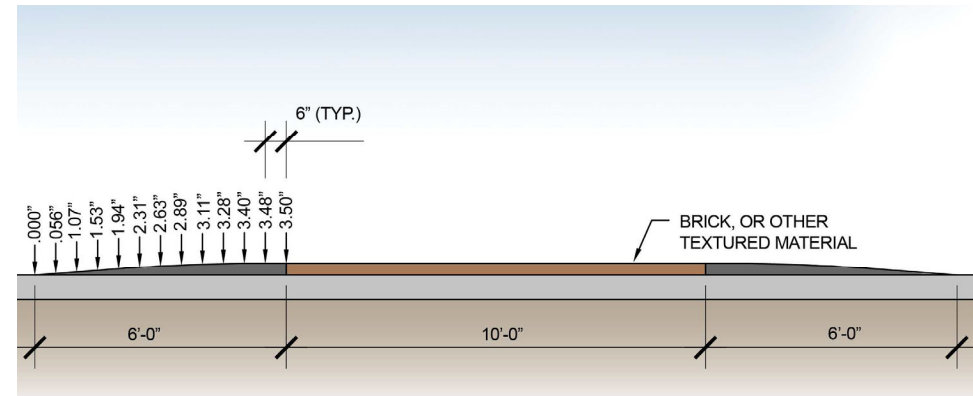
RAISED CROSSWALK SECTION A-A
